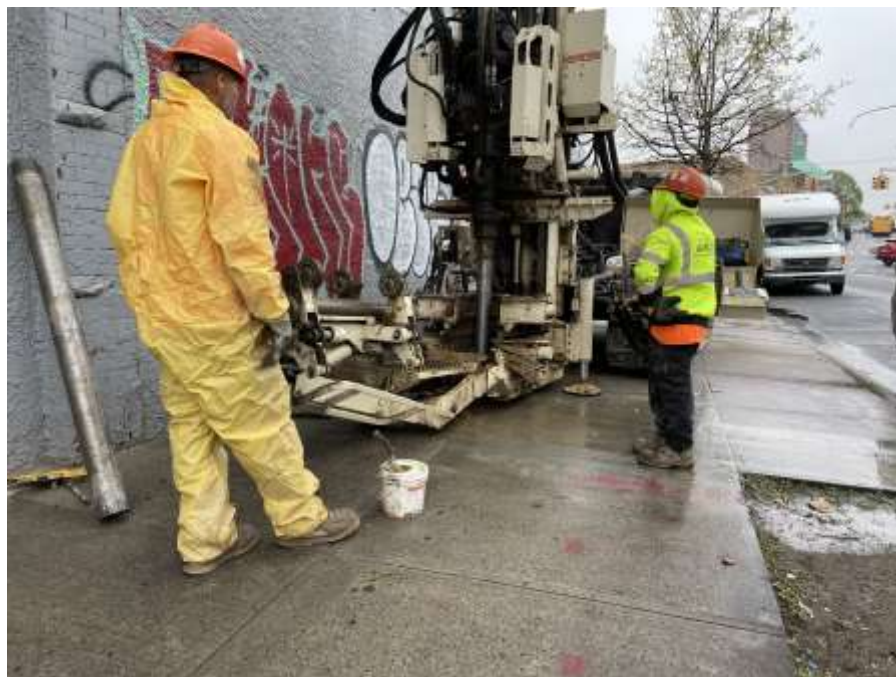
ARRCO preparing to install MW06 (facing northwest).
